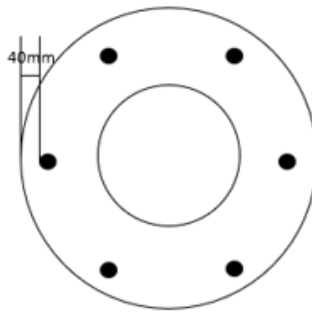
Steel reinforced tower cross-section (D11 and D12)
